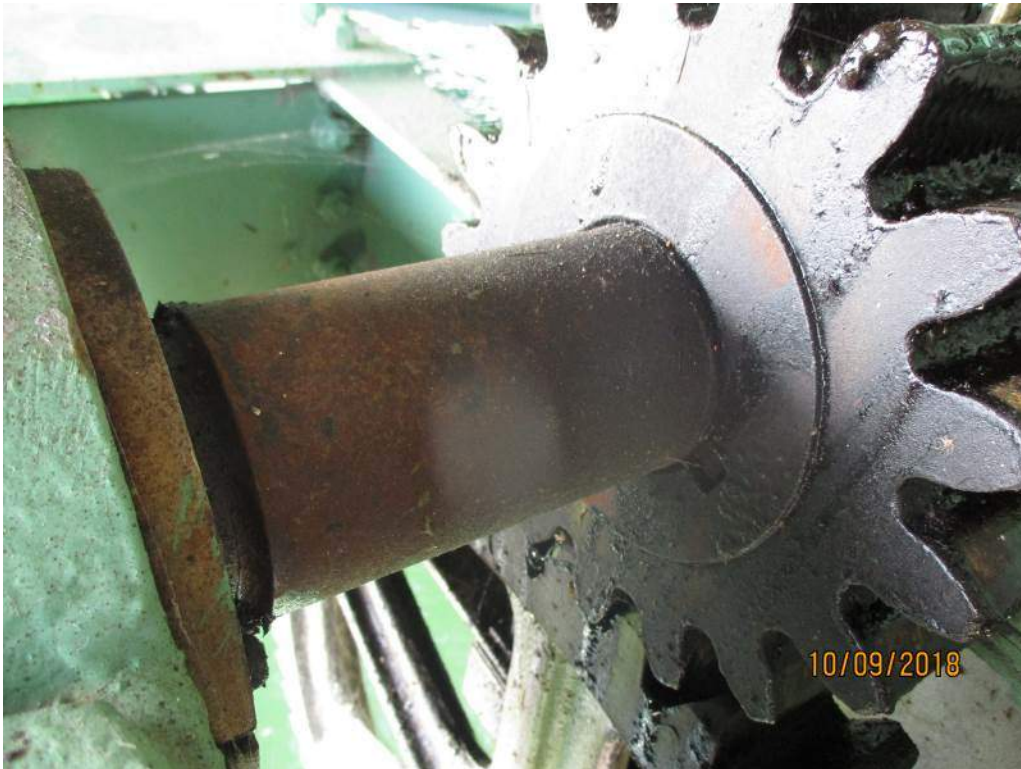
Span Lock Shaft. The span lock drive shaft between bearings B3 and B4 is not painted and corroded.
